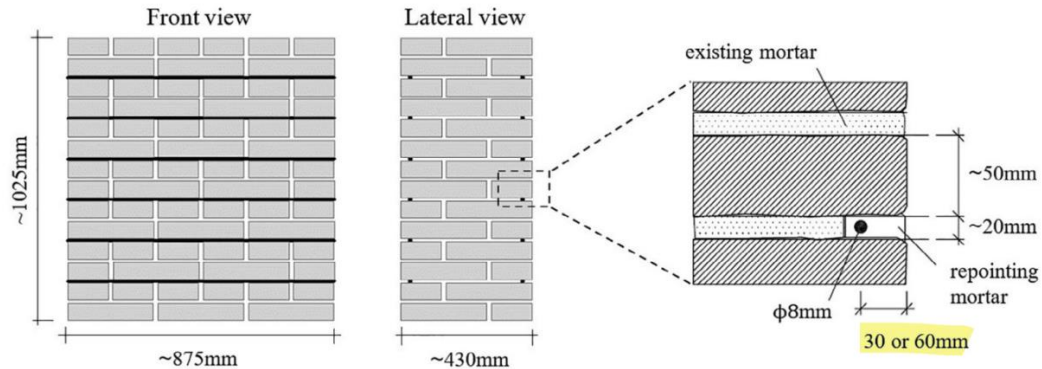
Detailed cross-section of structural repointing (source: Sandoval *et al.* (2021))
